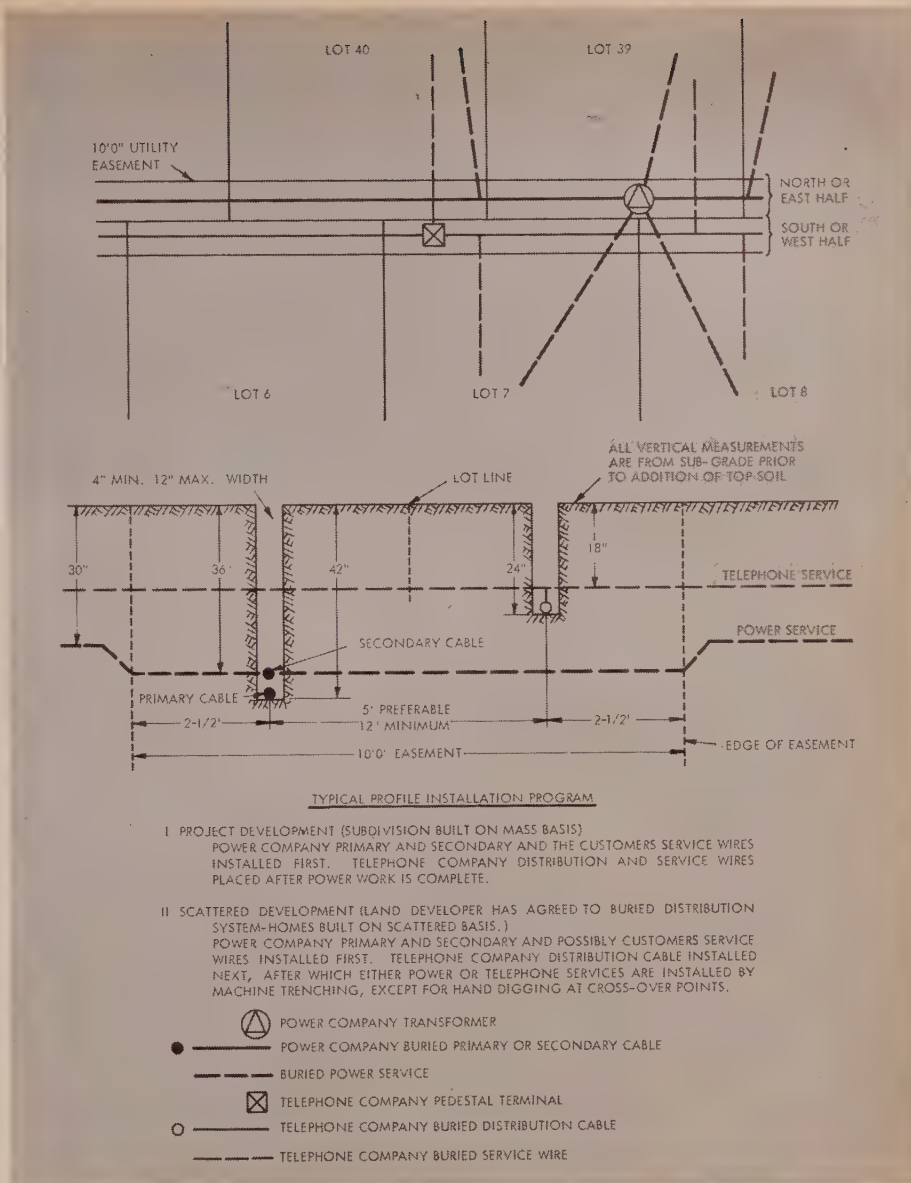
Sketch showing joint use of right-of-way easement for residential underground.
